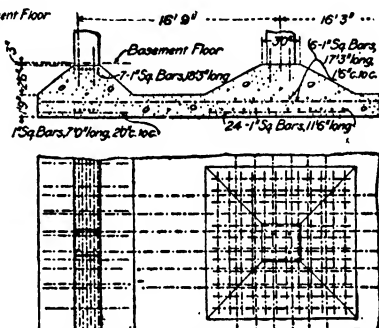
Mat Foundation of Flat-slab Type.
